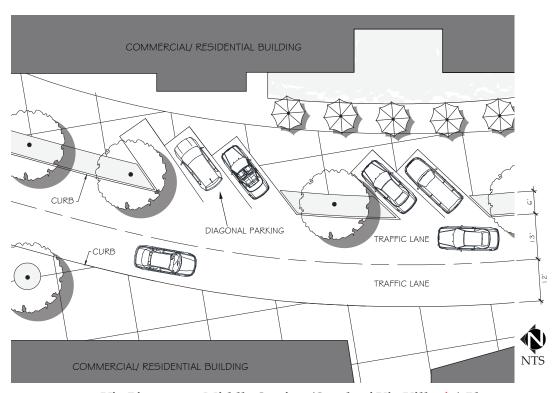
Via Villagio Roundabout Private Streetscape Plan
